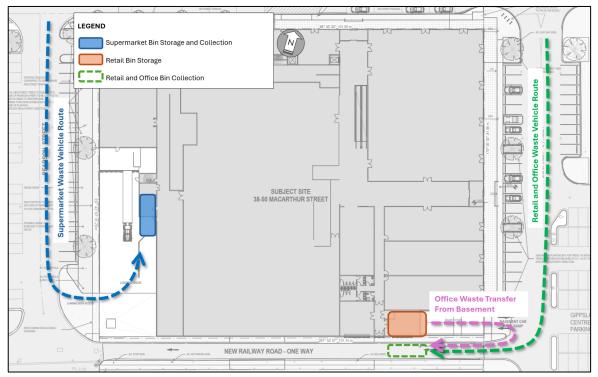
Ground Floor - Proposed Bin Storage and Collection Areas
